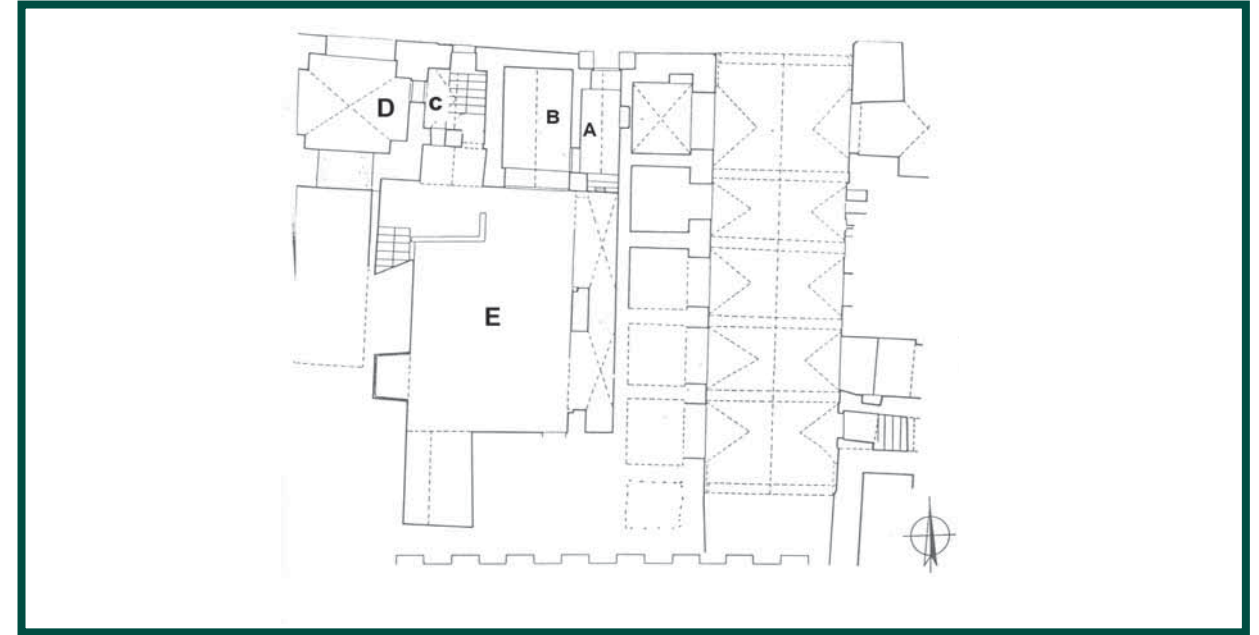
Plan of ground floor of Ribat Bairam Jawish
